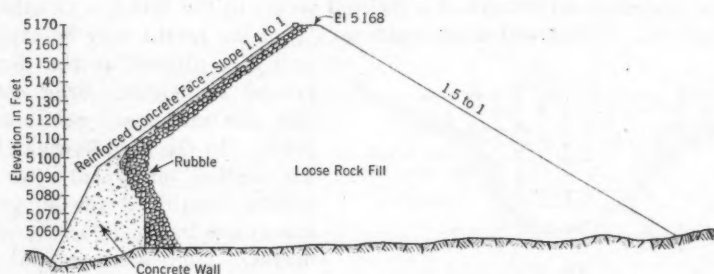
CROSS-SECTION OF BUCKS DAM
